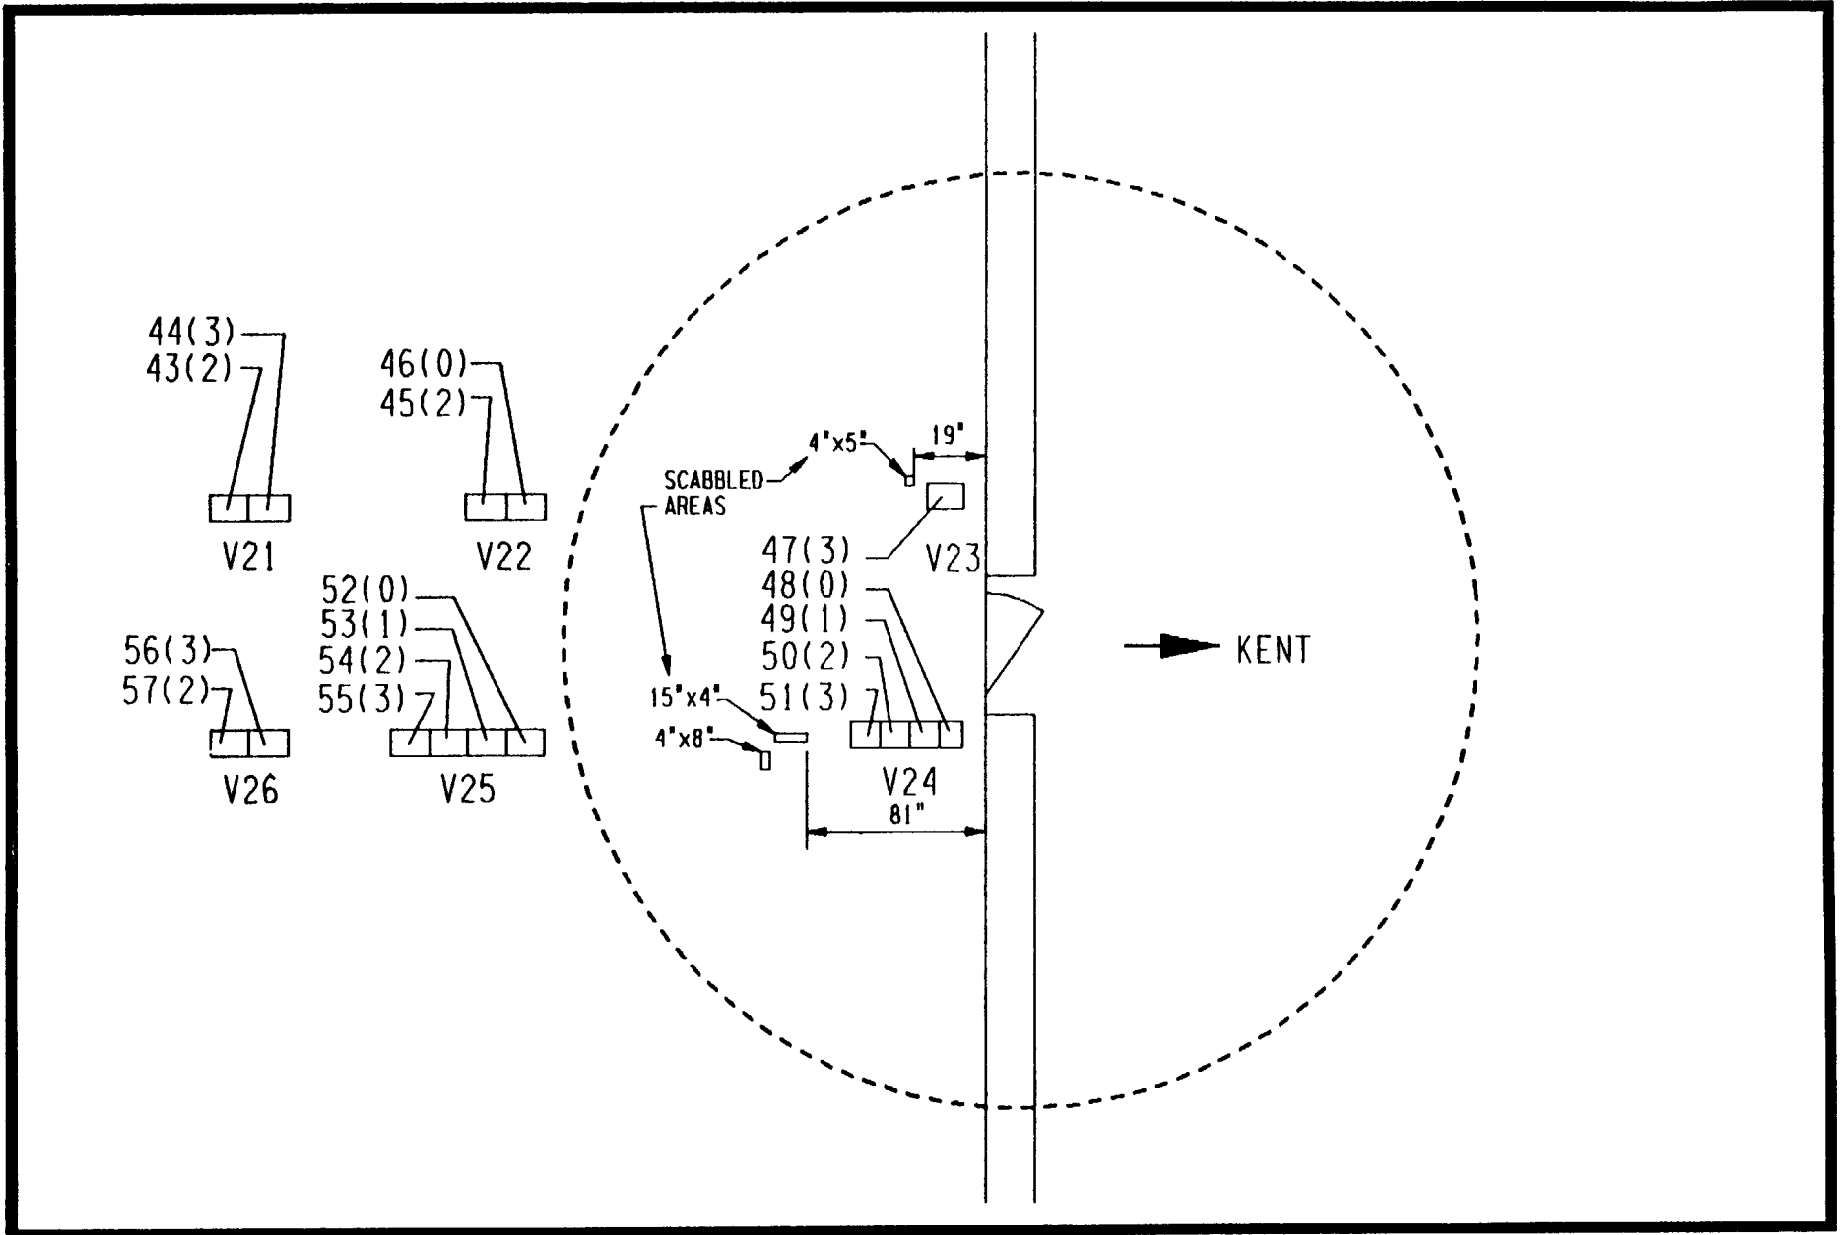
AREAS SCABBLED ON THE FOURTH FLOOR ATTIC FLOOR
